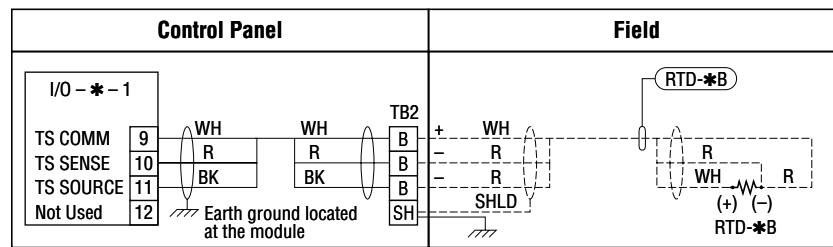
Typical RTD installation from the NGC-40-IO module in a North American style panel
